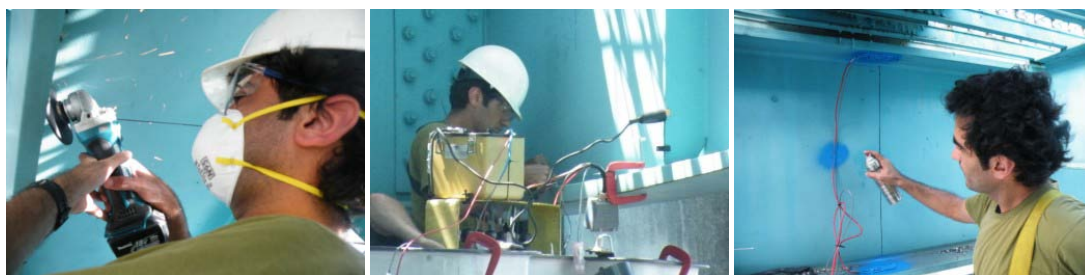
Strain Gage Installation Steps Under the Bridge: Grinding, Welding and Painting
